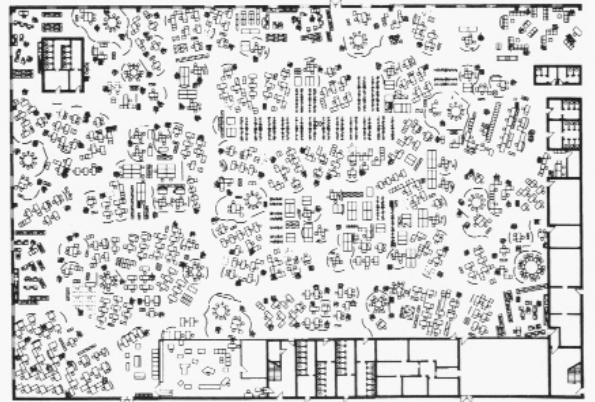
The concept of burolandschaft: GEG Versand Kamen building, floor plan (Source: Laing 1997: 28).
